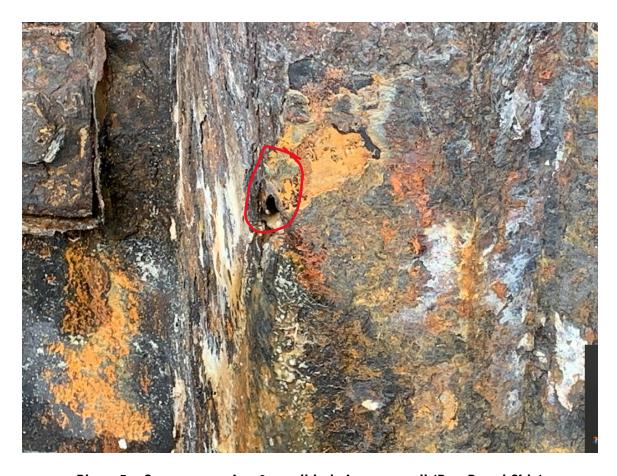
Severe corrosion & small hole in west wall (Port Royal Side)
